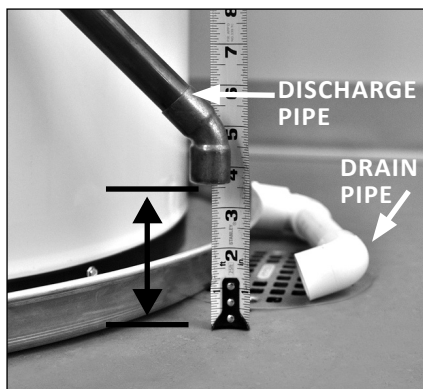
The end of the T&P Relief Valve discharge pipe must stop no more than six inches above a floor drain or terminate outside the building.
